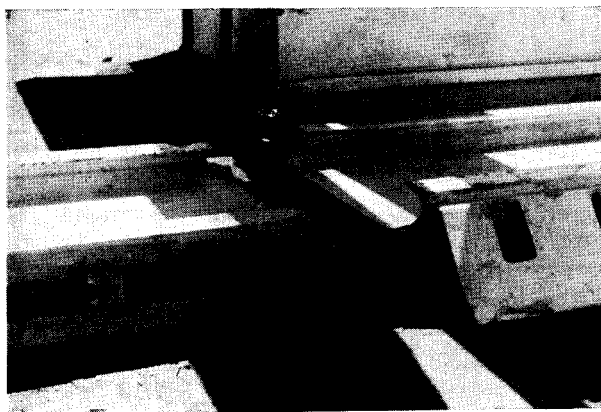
(c)—Left—light pan with welded connecting lugs. Right—heavy duty pan with cast end.
